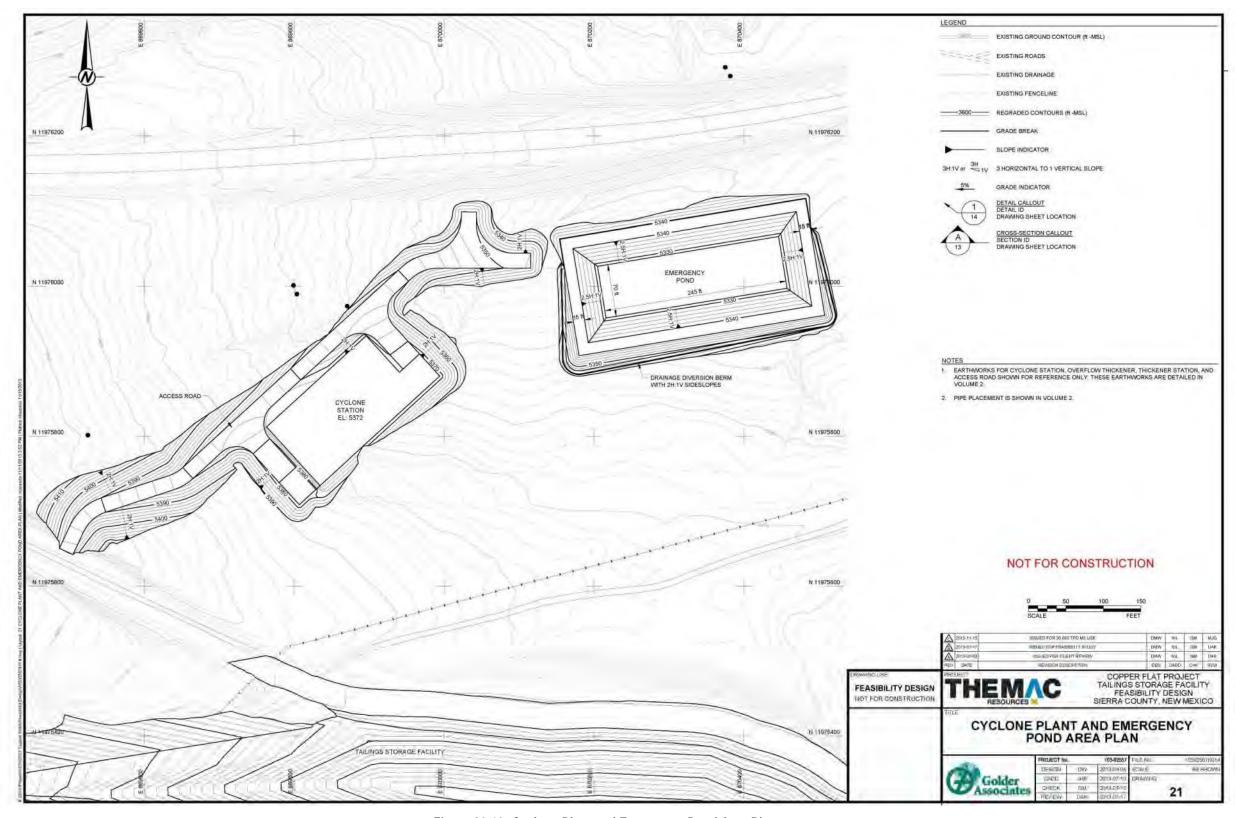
Cyclone Plant and Emergency Pond Area Plan
